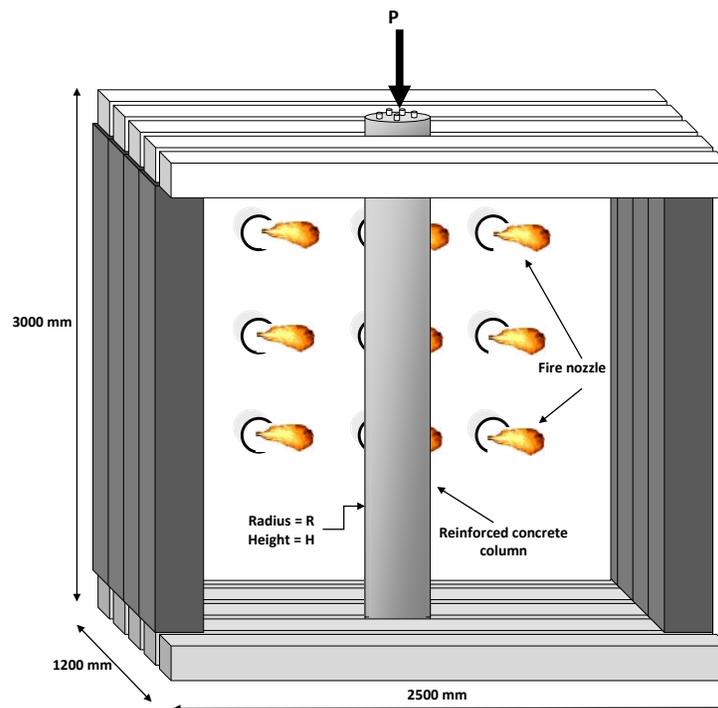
Schematic of a furnace and test setup for a full-scale fire test on a reinforced concrete column
